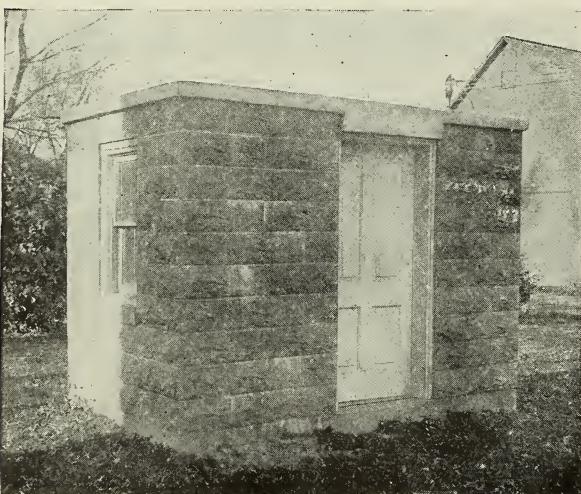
Concrete Block Well House with concrete roof. S. J. Forbes, Owner, Marshall, Minnesota. Built by the Marshall Tile and Sidewalk Company.
